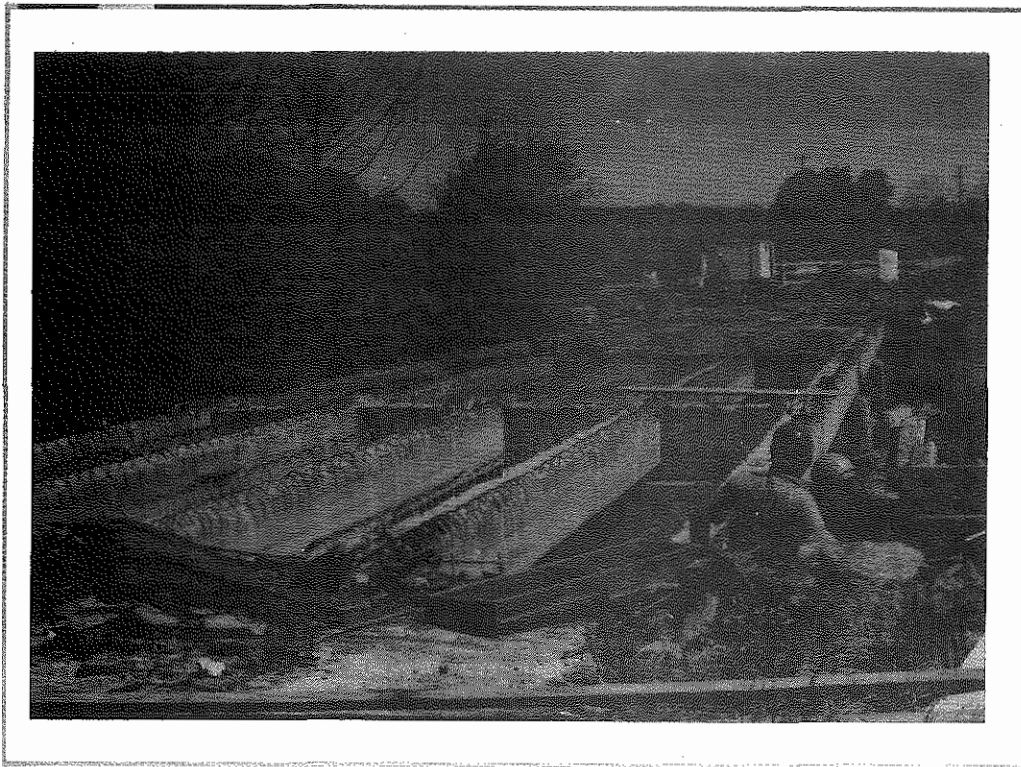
Remaining Girders Used for Reconstructing the Bridge Deck.
